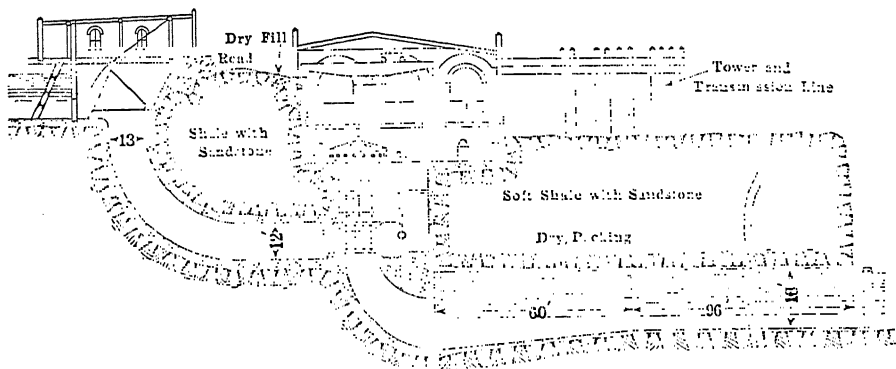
Head Works and Tailrace Tunnel of Station No. 2 Calgary Power Company in Canada
